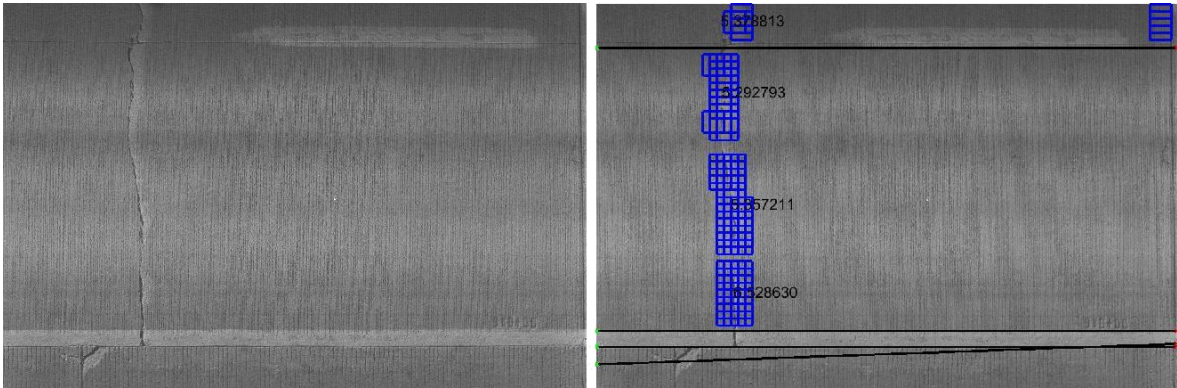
Example of computing crack width at high severity: raw crack (left) and crack detection (right)
